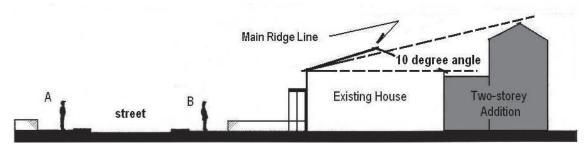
Side view of a two-storey addition to a single storey dwelling may be partially visible in distant views (eg to person A) but should be contained within a 10° building envelope established from the front of the dwelling and using the gutter line as the base line. The addition should be almost wholly invisible to person B.
